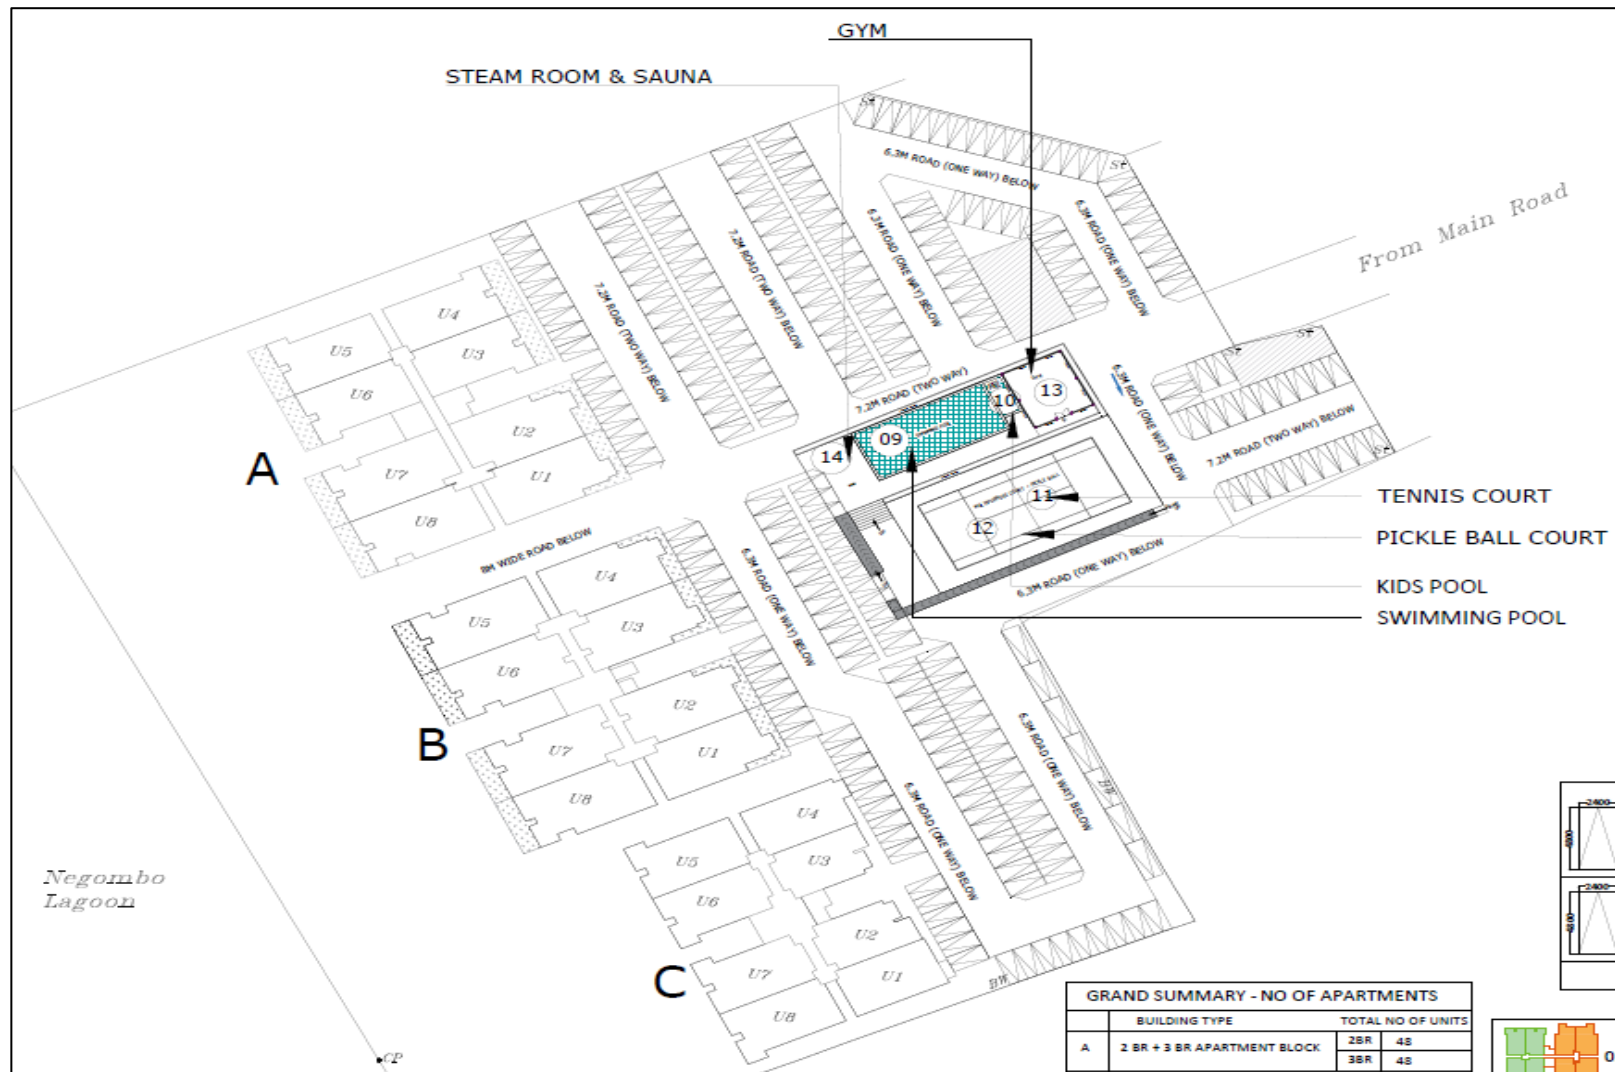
7: Project Layout Plan of Upper Level of Proposed Apartment Project
